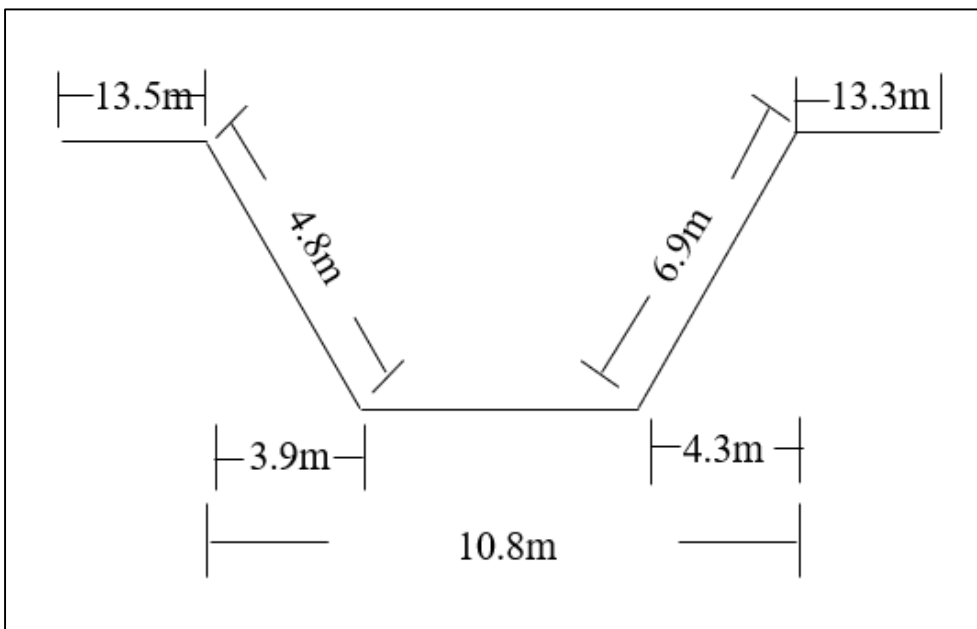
The river cross section for the Batu Lancang (Observation point 11)
